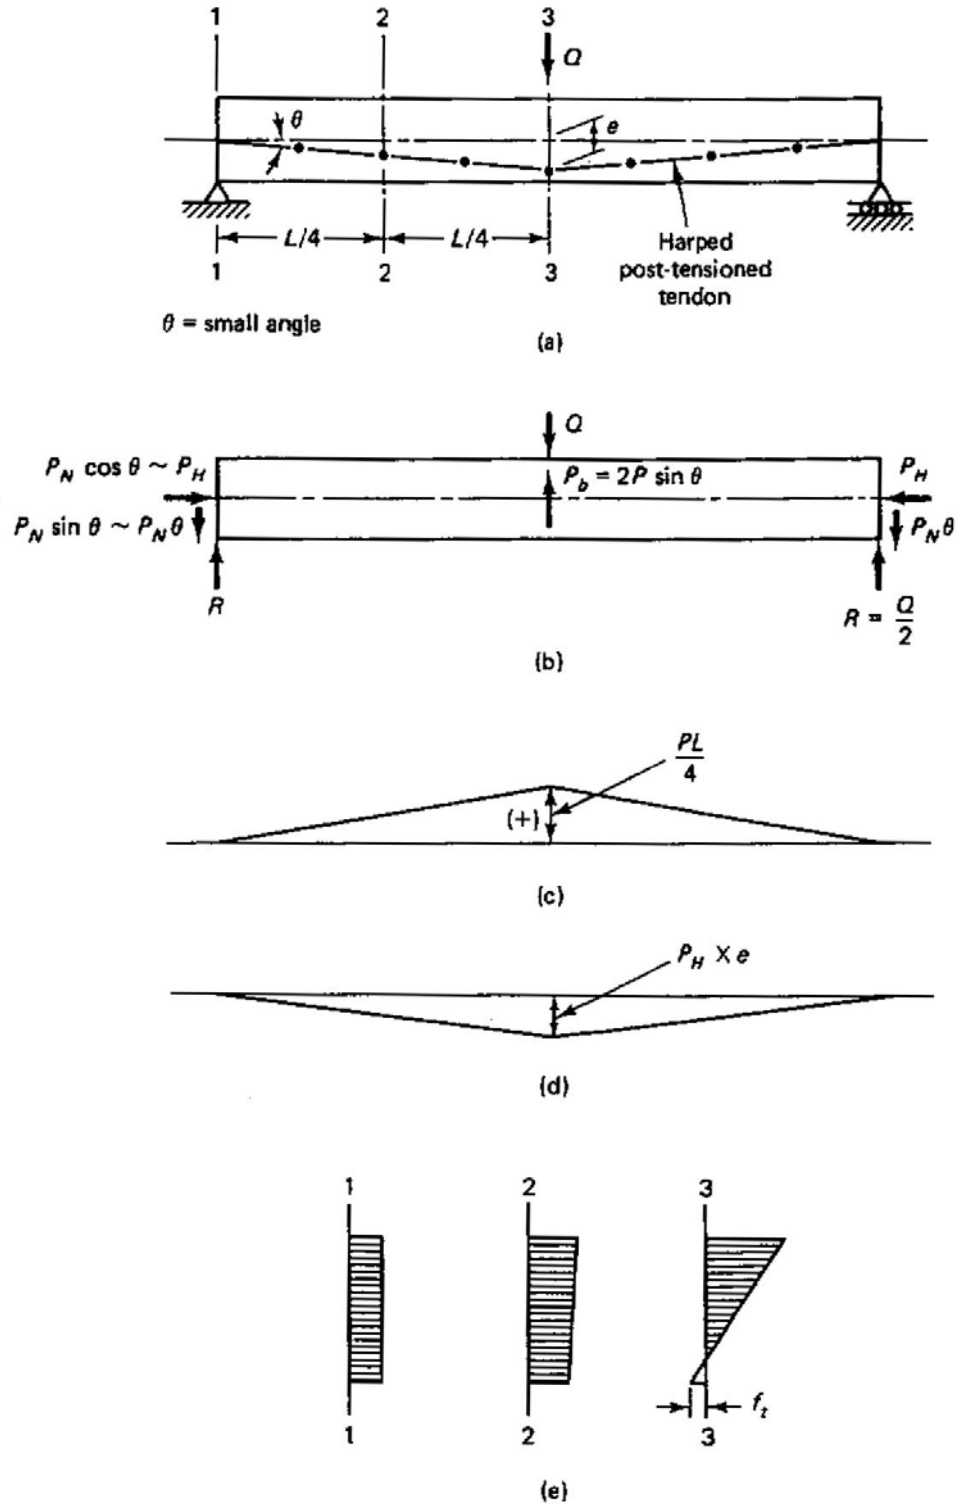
Beam with harped tendon. (a) Beam elevation. (b) Free-body diagram. (c) External load bending moment diagram. (d) Prestressing force bending moment diagram. (e) Typical stress distribution in sections 1, 2, and 3 (Equation 4.3).
